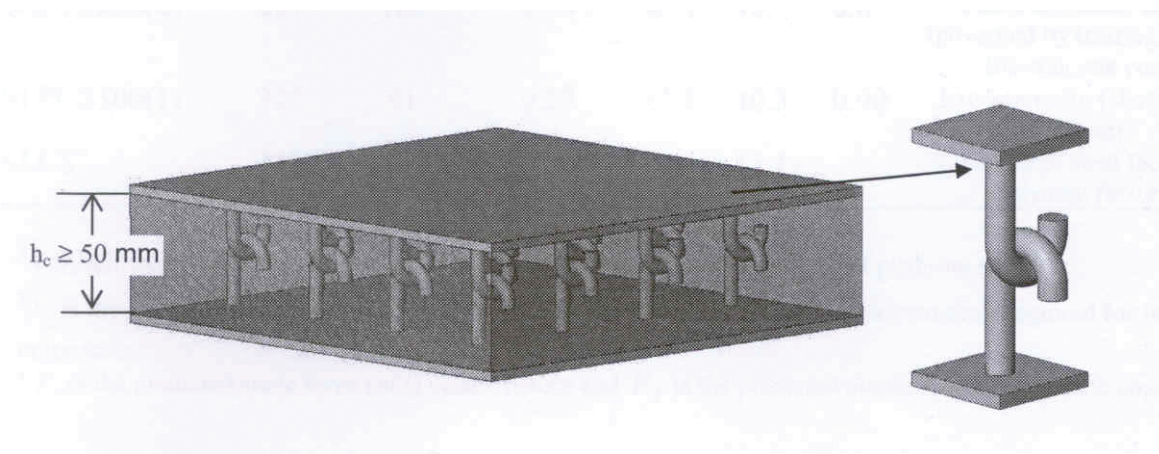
Steel-concrete-steel sandwich element with J-hook shear connectors. (Courtesy of Professor J. Y. Richard Liew)
